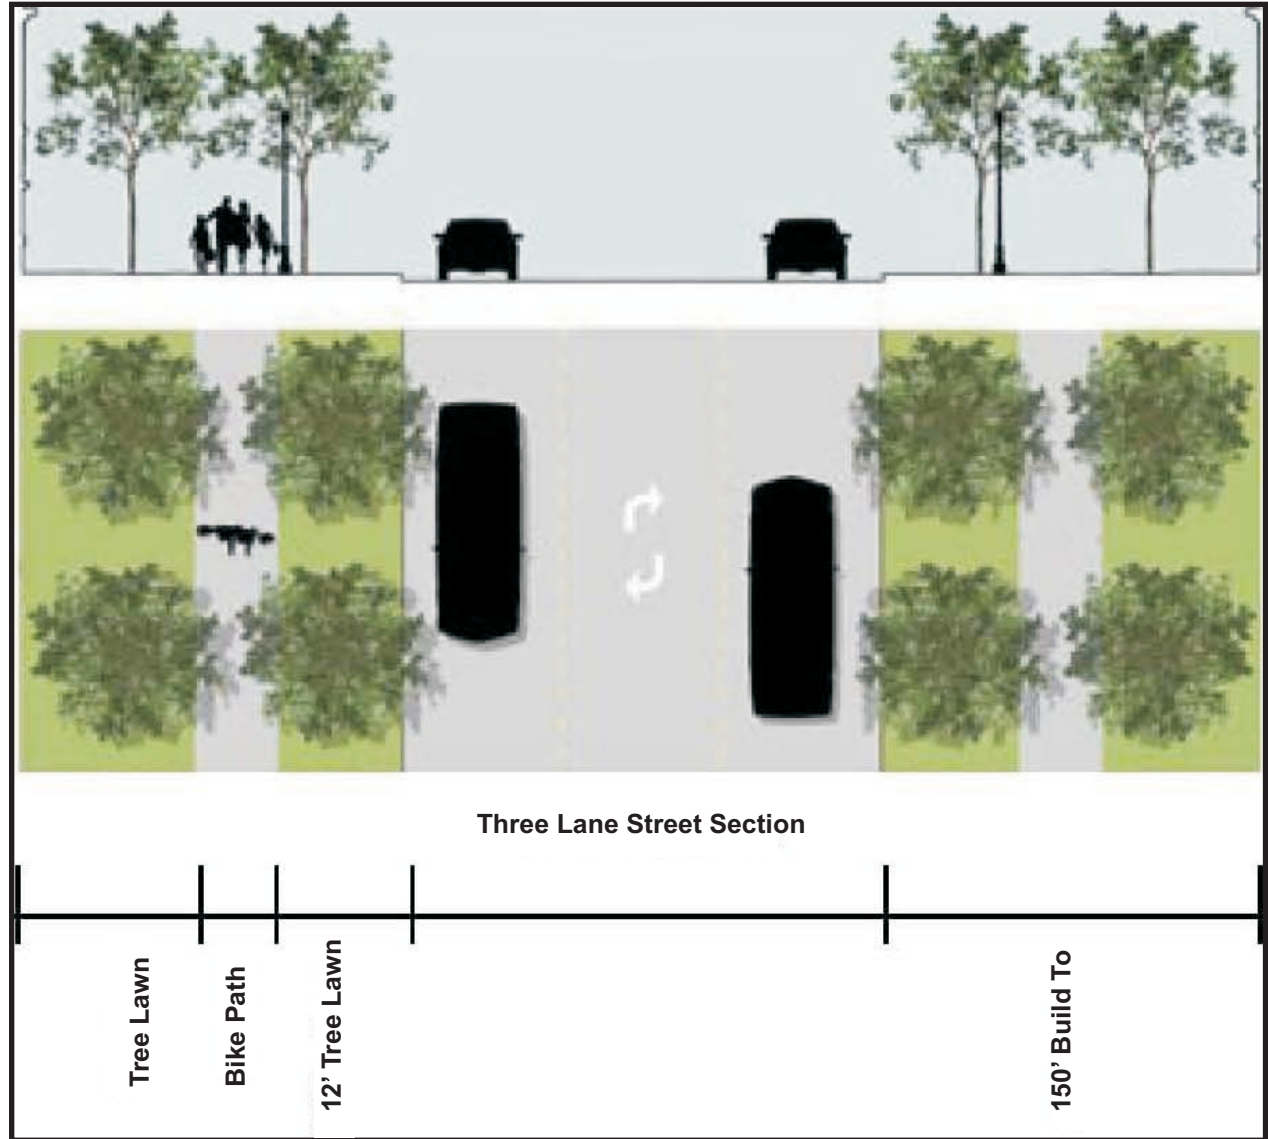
Neighborhood Commercial Street Typology (Source: Etna Township 310 Corridor Plan: Draft, MSI Planning and Design).
